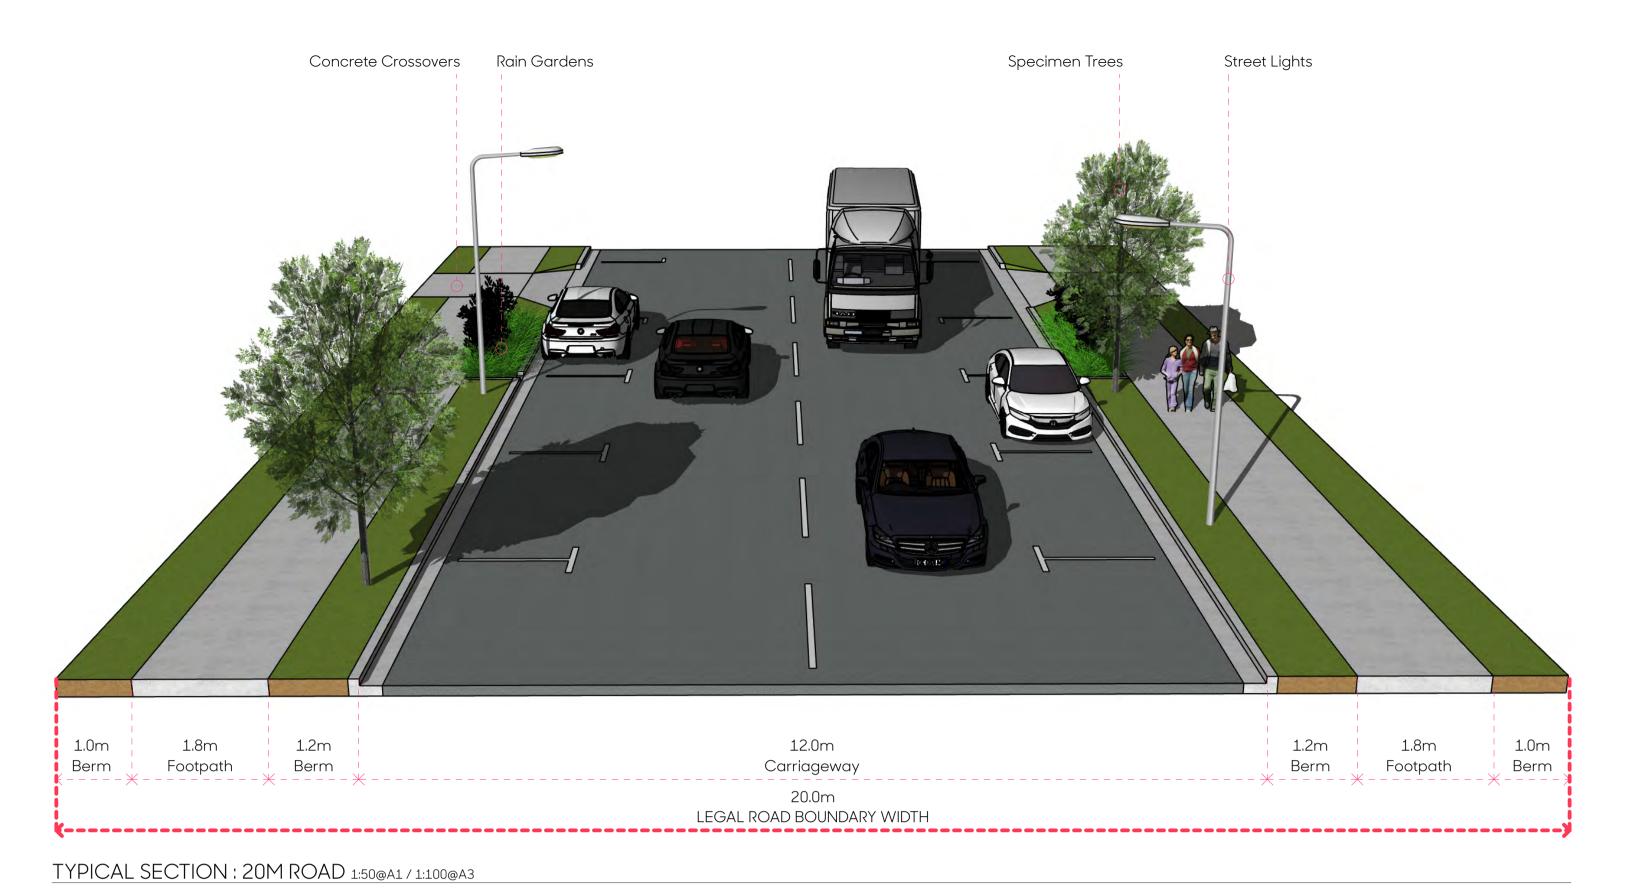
/13 Streetscape Landscape Plan 06 & 07
